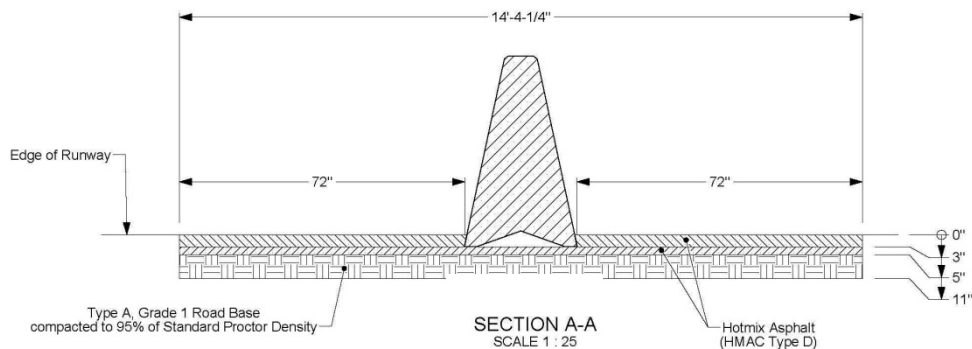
Cross Section of the Installation for Washington Concrete Traffic Barrier with Acoustic Coating.
